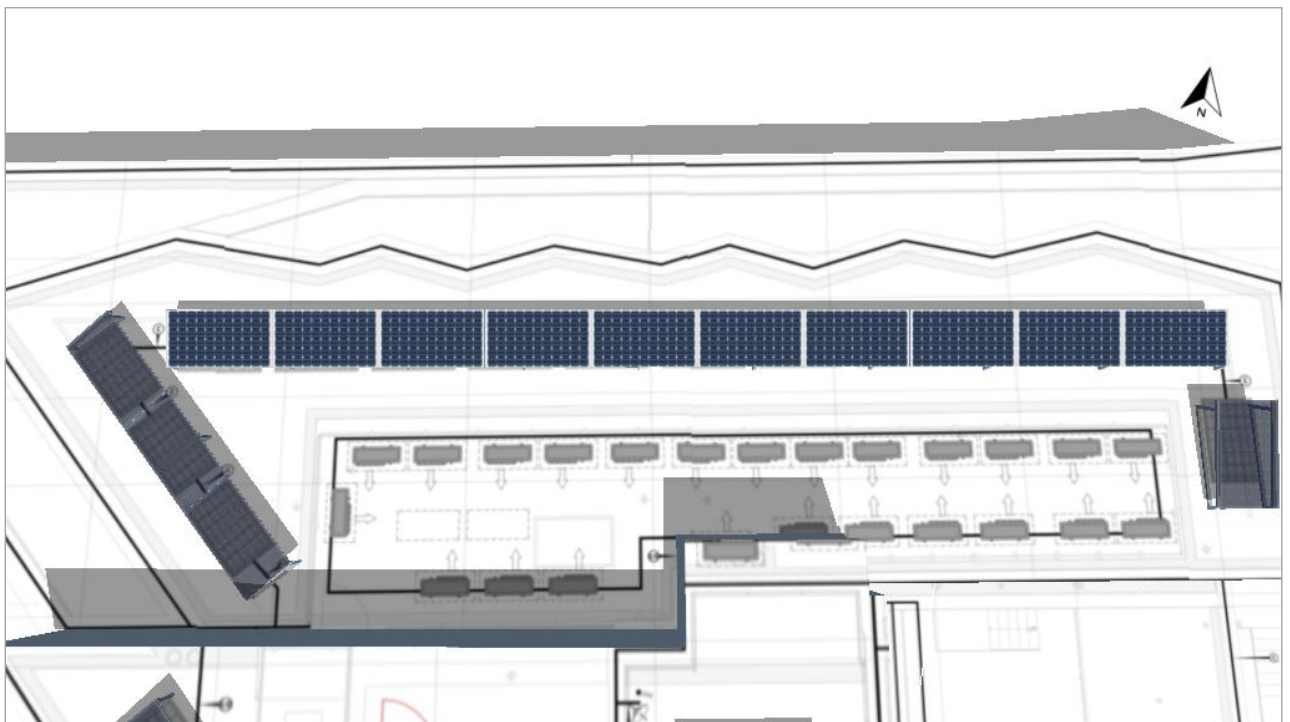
Module Area - Arbitrary Building 01-Mounting Surface North
